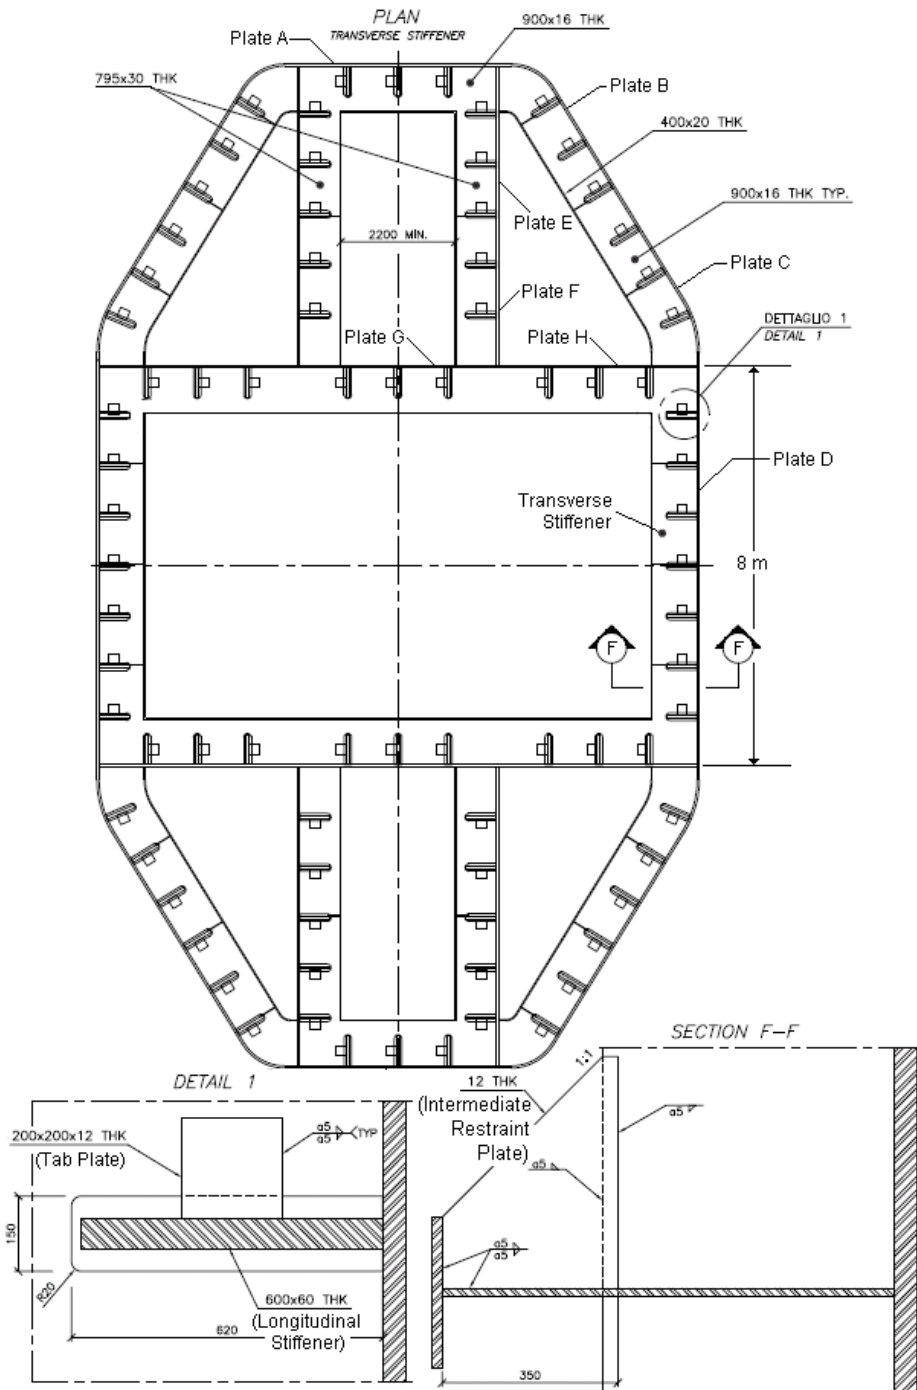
Typical tower leg cross section at a transverse stiffener, tab plate details and intermediate restraint plate details.
